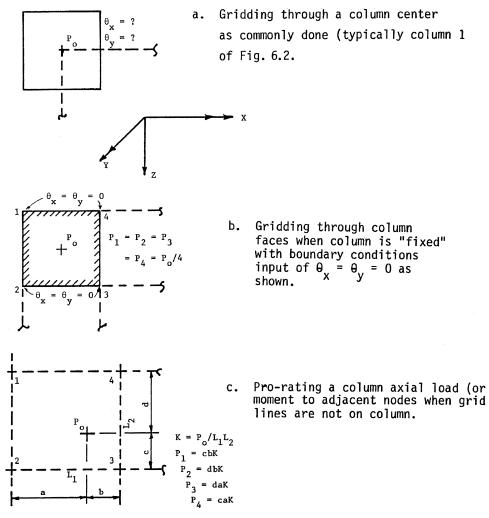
Procedures for modeling columns and column loads into one of the discrete (finite) element procedures.
